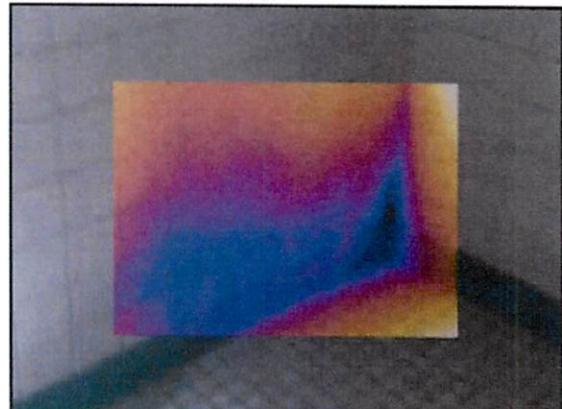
South wing restroom, shower area, evidence of residual moisture in wall system as viewed through IR camera
